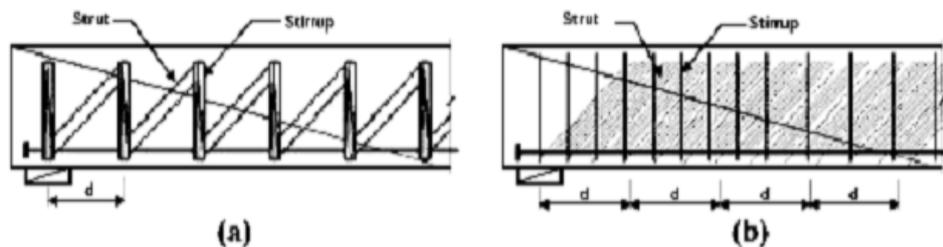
Parallel chord truss model. The struts are intercepted by the stirrups at spacing of d (Ritter, 1899)
